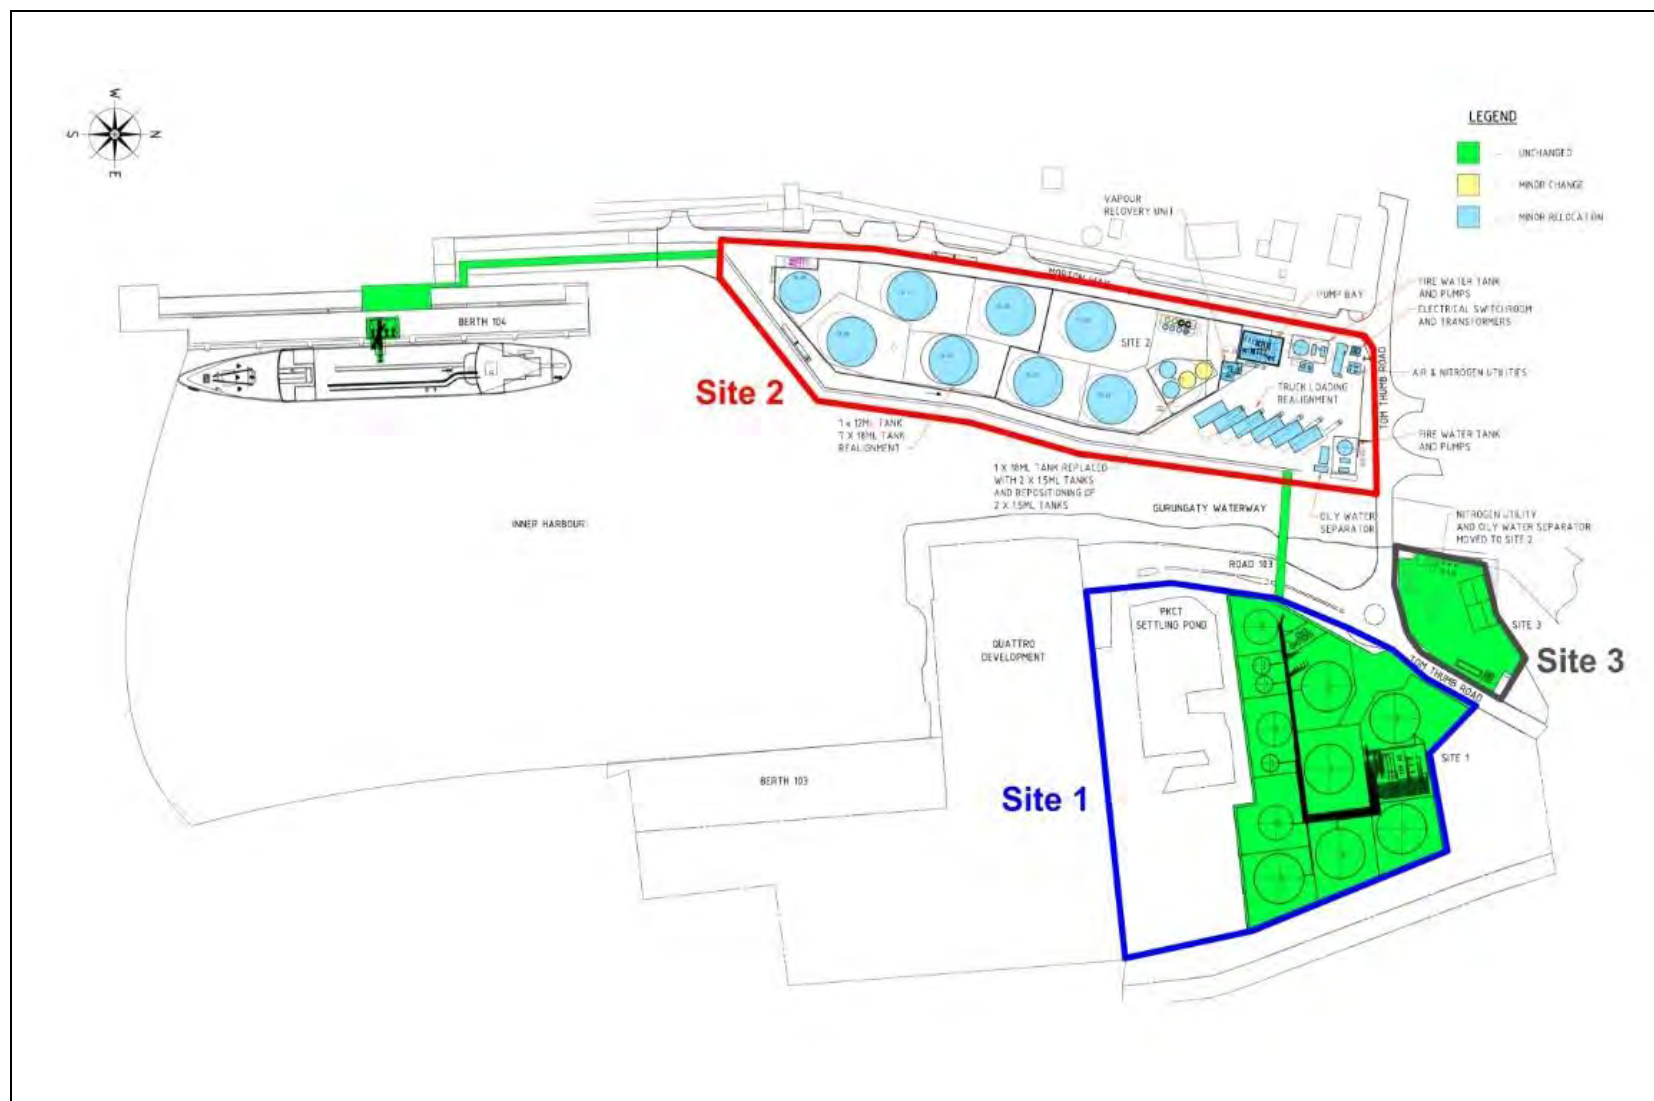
Project Modification Site Plan (TQ Holdings, 2016)
